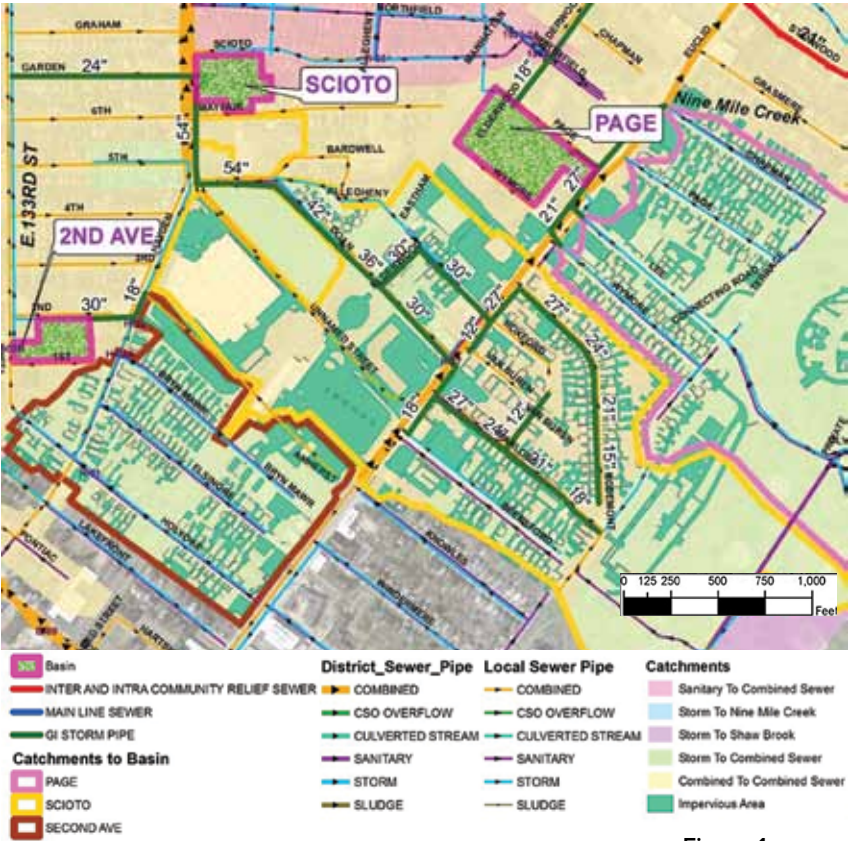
Page, Scioto, and Second Avenue stormwater management systems
